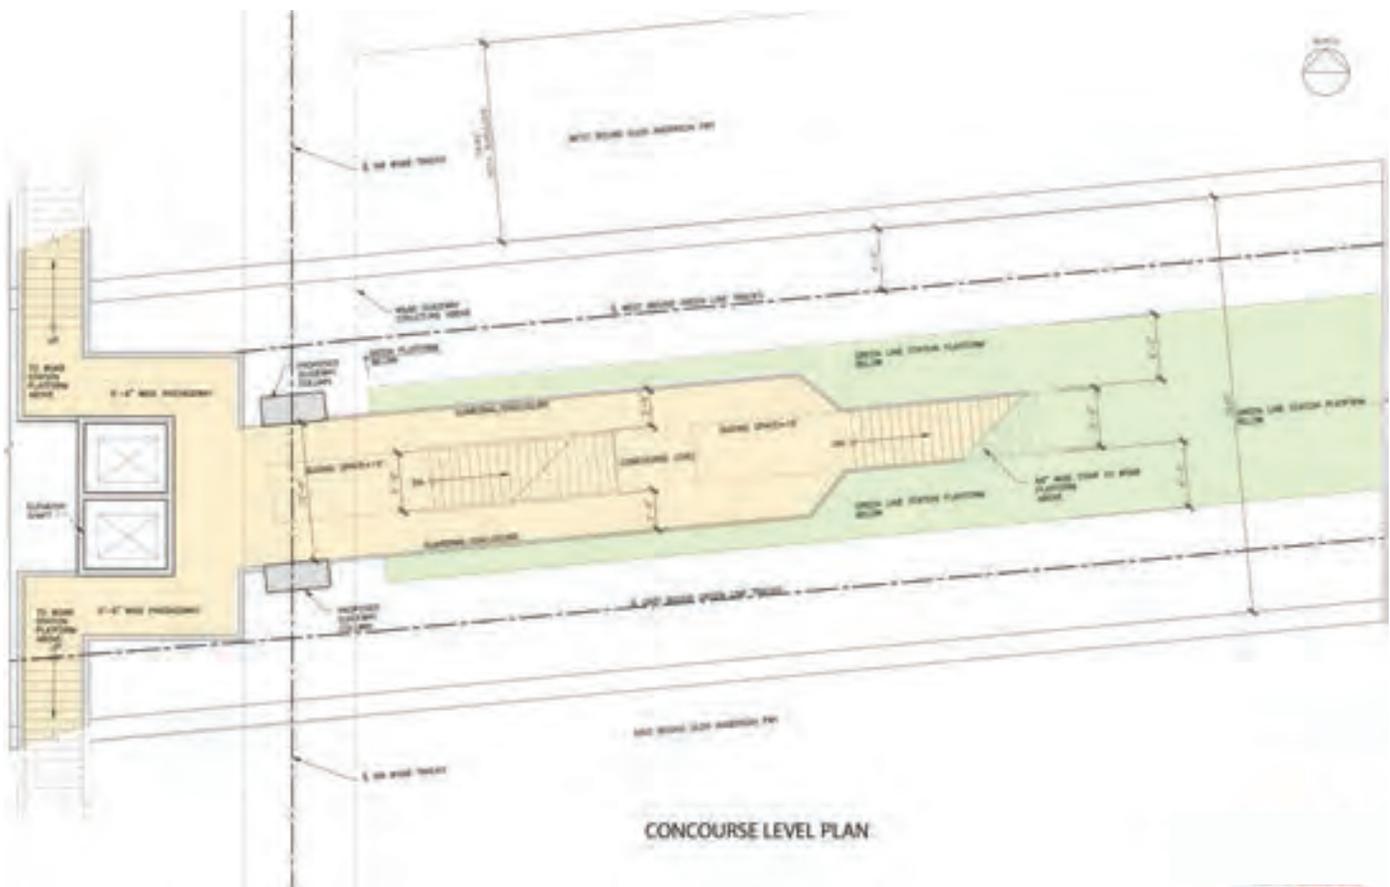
Station concept plan for new Metro Green Line Station and vertical circulation up to new WSAB/Green Line Station
